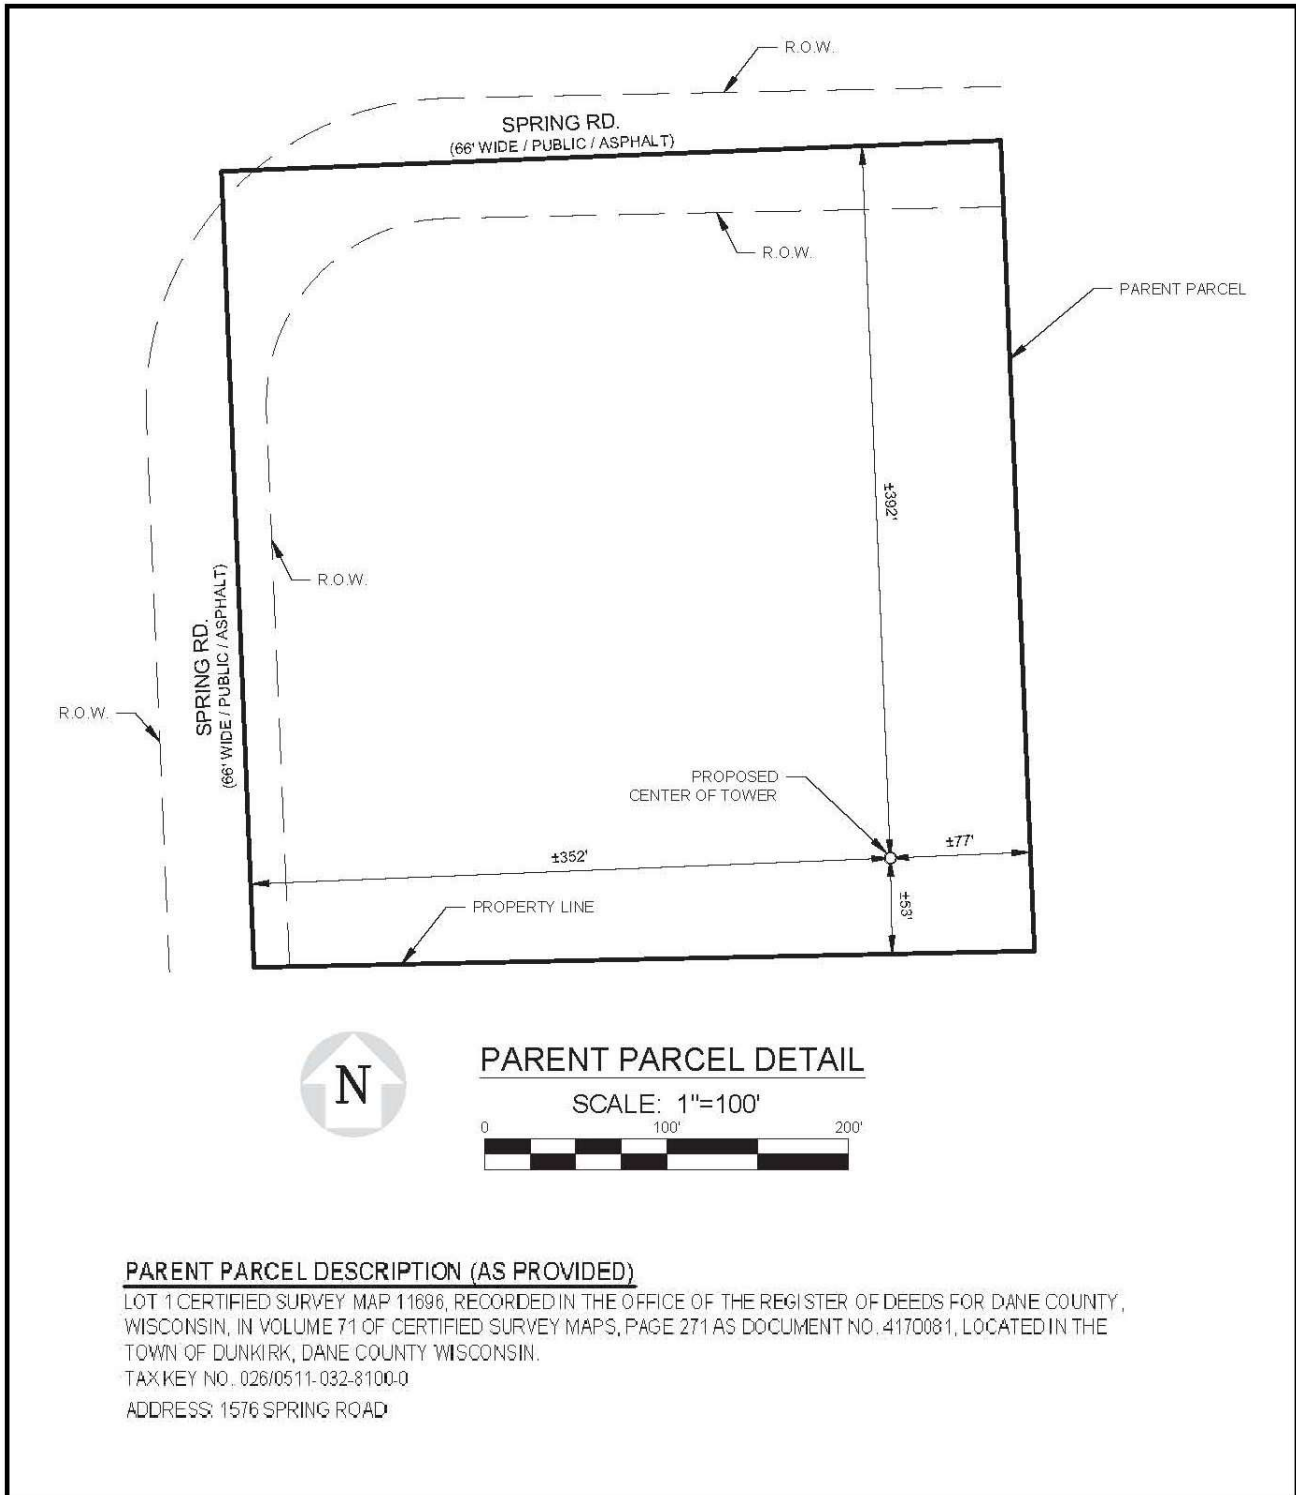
Parcel Plan Drawing with Tower Property Line Setbacks
